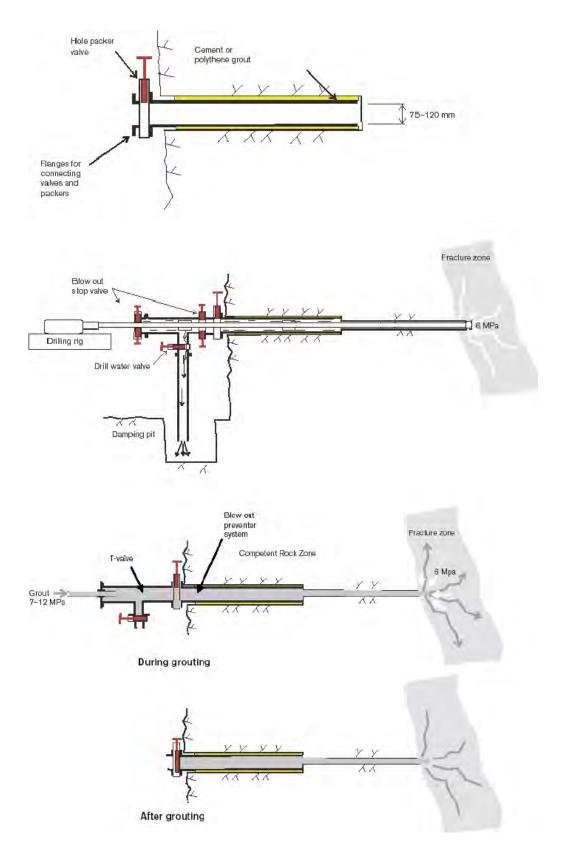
Principles for drilling and grouting using Blow-Out-Preventer systems (from /Chang et al. 2005/). It should be noted that water and grout pressures stated in the figure relate to the drilling and grouting regime described in /Chang et al. 2005/.
